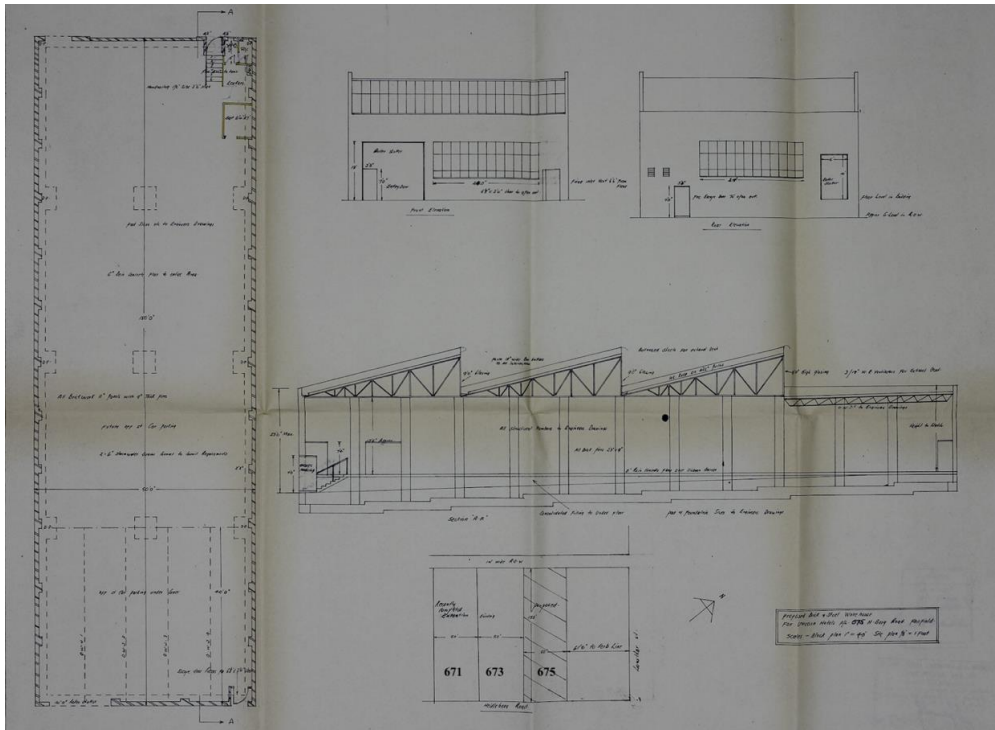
Factory Plans (detail) Approved March 1967, showing plans for a new brick and steel factory at 675 Heidelberg Road Alphington. No architect or plan author is listed (source: PROV VPRS10150/P0000/128 064 Heidelberg Road).
